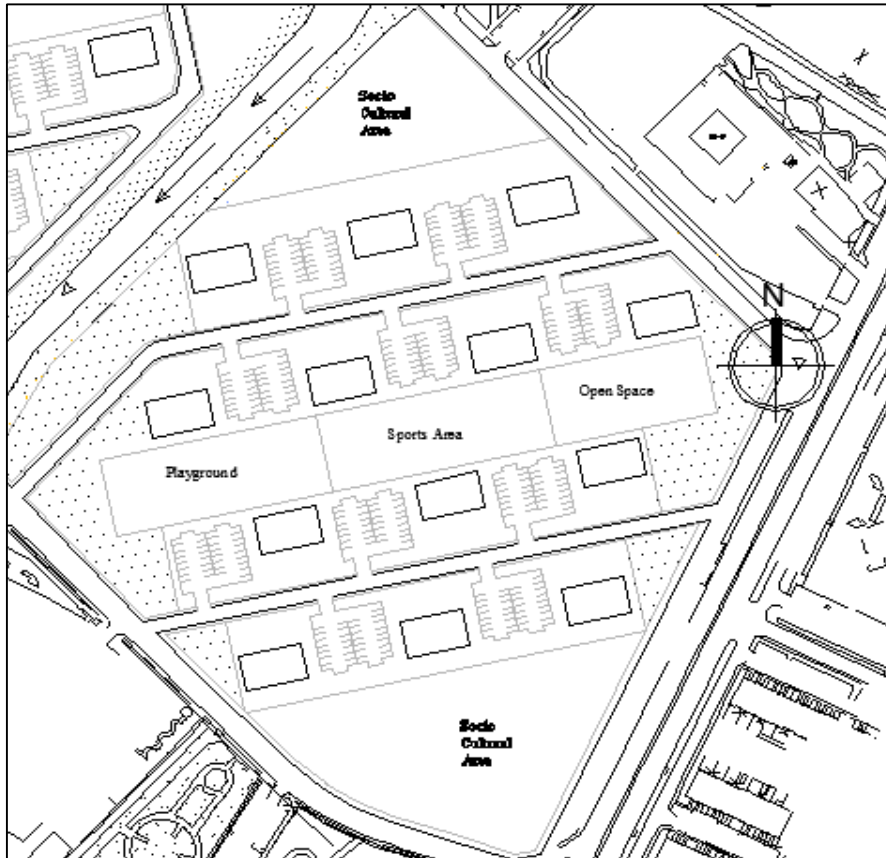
Site plan of eight-storey buildings alternative (Section 3).
